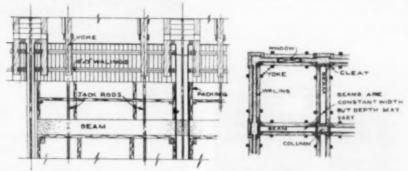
Moving Forms above the Level of a Floor of an "Open" Structure.
